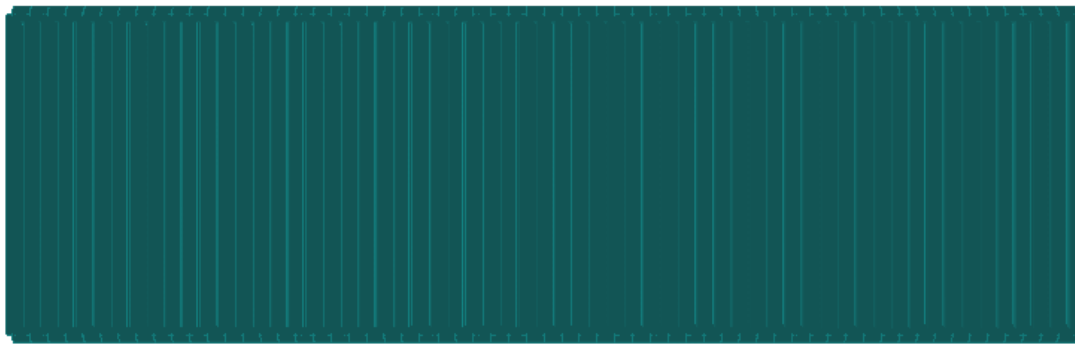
Deck of Pedestrian bridge made up of Steel section (S1)
